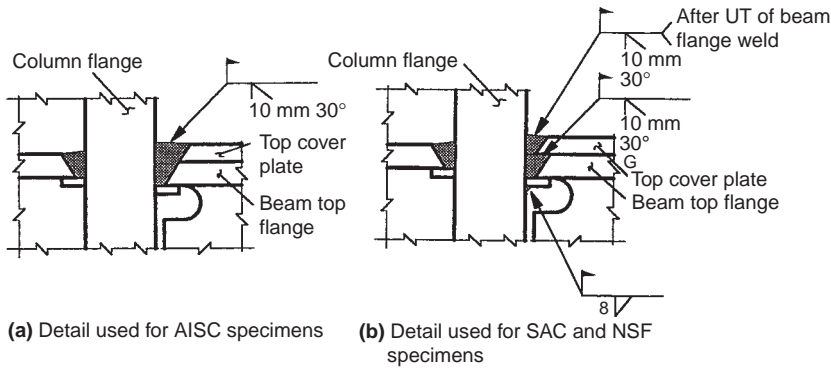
Typical groove weld details at top flange used for moment connection strengthened by cover plates. (Courtesy of M. D. Engelhardt, Dept. of Civil Engineering, University of Texas, Austin.)
